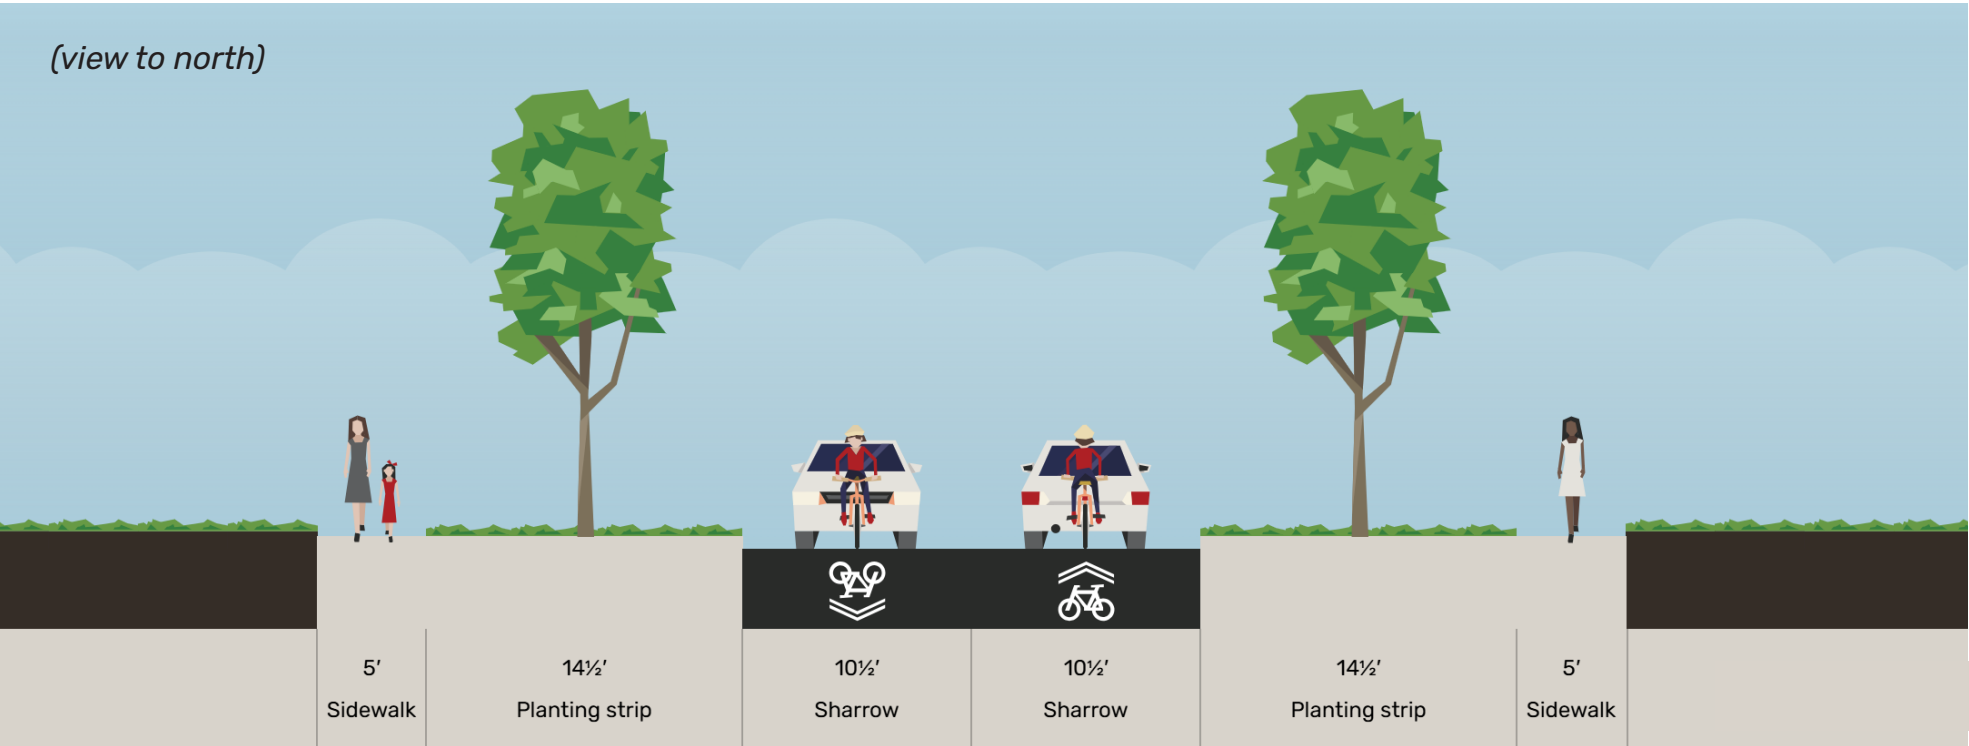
Proposed Typical Cross-Section on Tower Ridge Drive from Meadowview Drive to Cliff Oaks Drive (60’ ROW)
